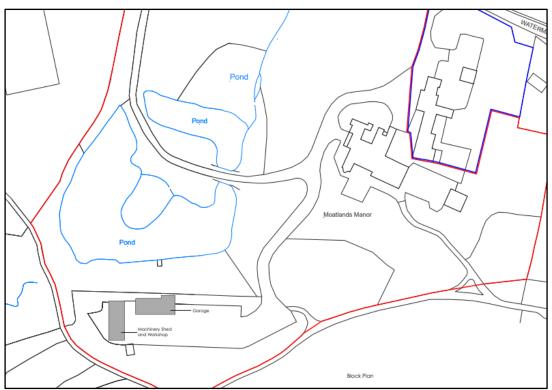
GARAGE BUILDING (KENT BUILDING CONTROL)
